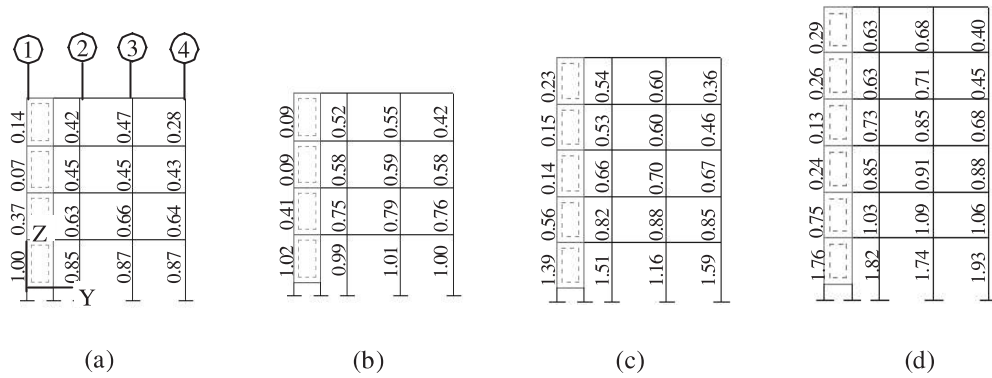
The column and shear-wall capacity ratios for axis A-A of SWF buildings: (a) 4-storey, (b) 4-storey with terrace floor, (c) 5-storey, (d) 6-storey building.
